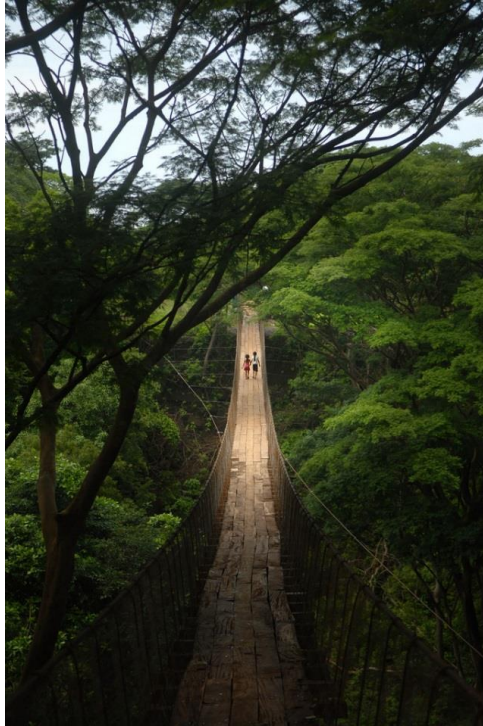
A suspended bridge with visible windguy arrangement below (With permission from Bridges to Prosperity)
